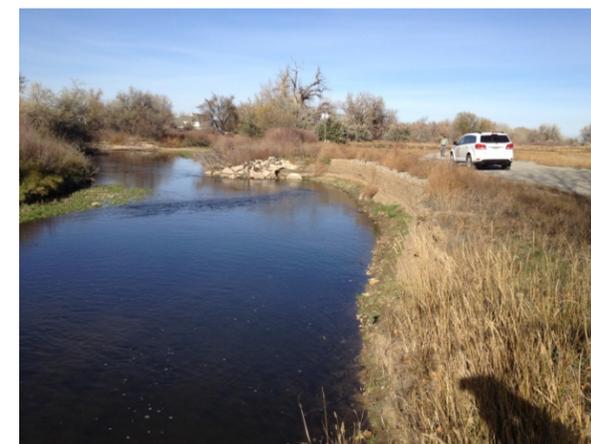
Bank erosion at the Town of Erie Reuse Pond (Reach 4)
